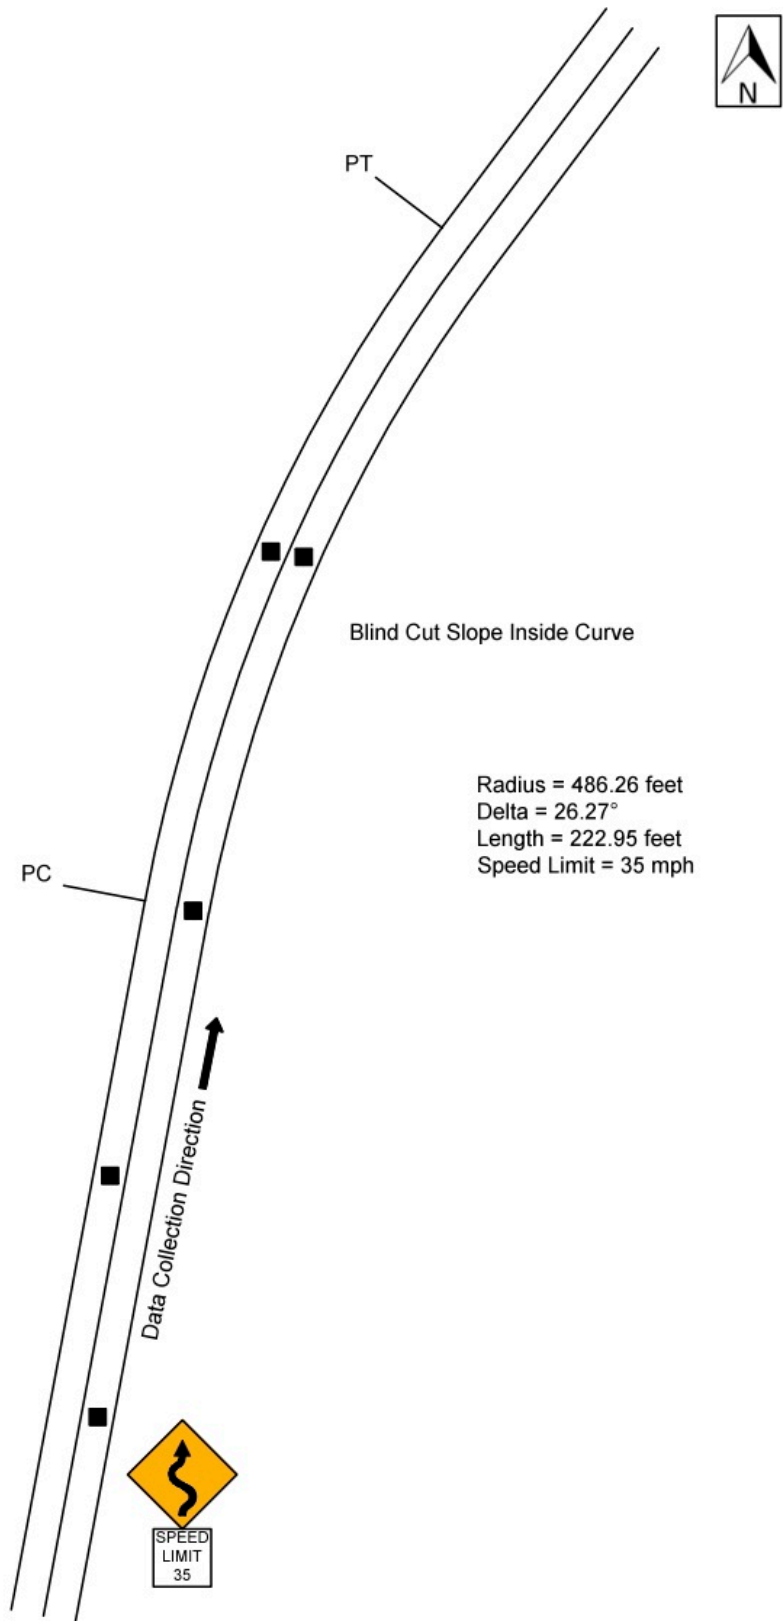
Diagram. Geometric layout of Alabama Location #8 (not to scale).
